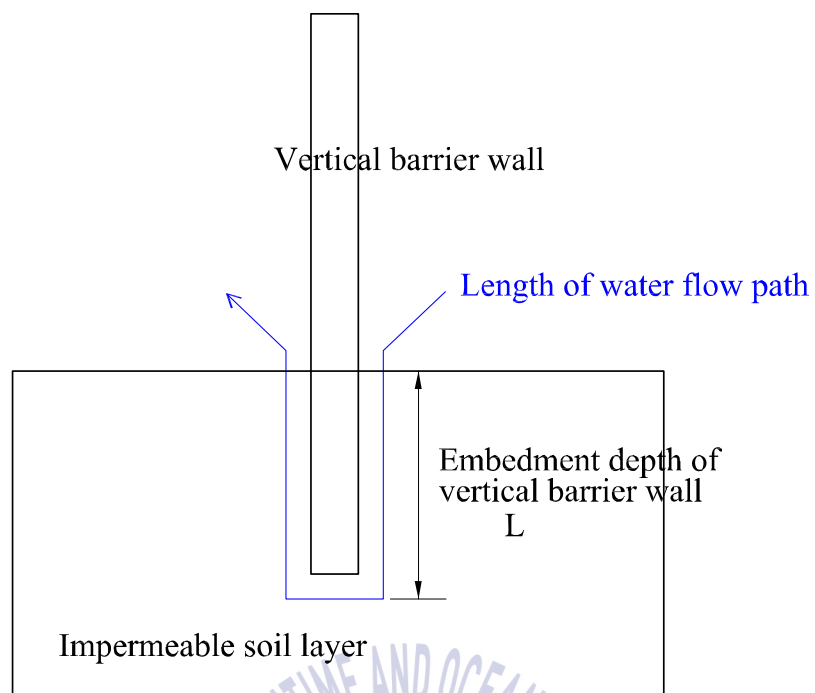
Embedment depth of vertical wall for preventing leakage
